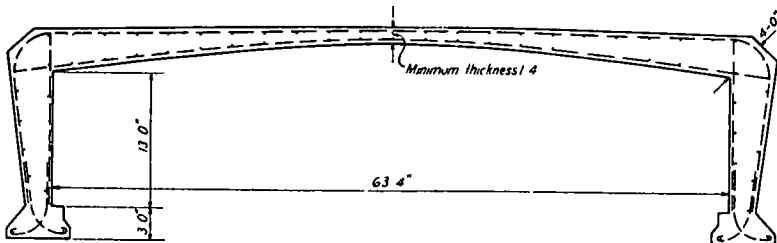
Typical Details of Solid Section Rigid Frame Bridge
